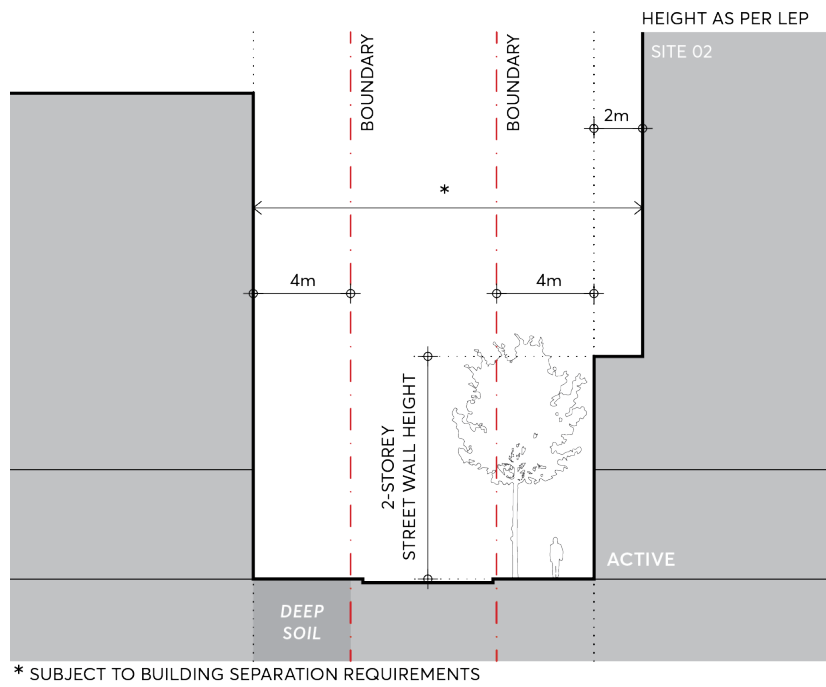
Station Lane (Section D) Setbacks and Street Wall Height
